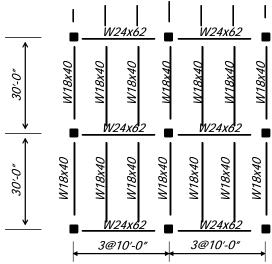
Typical Floor Framing Evaluated for Collapse Resistance
